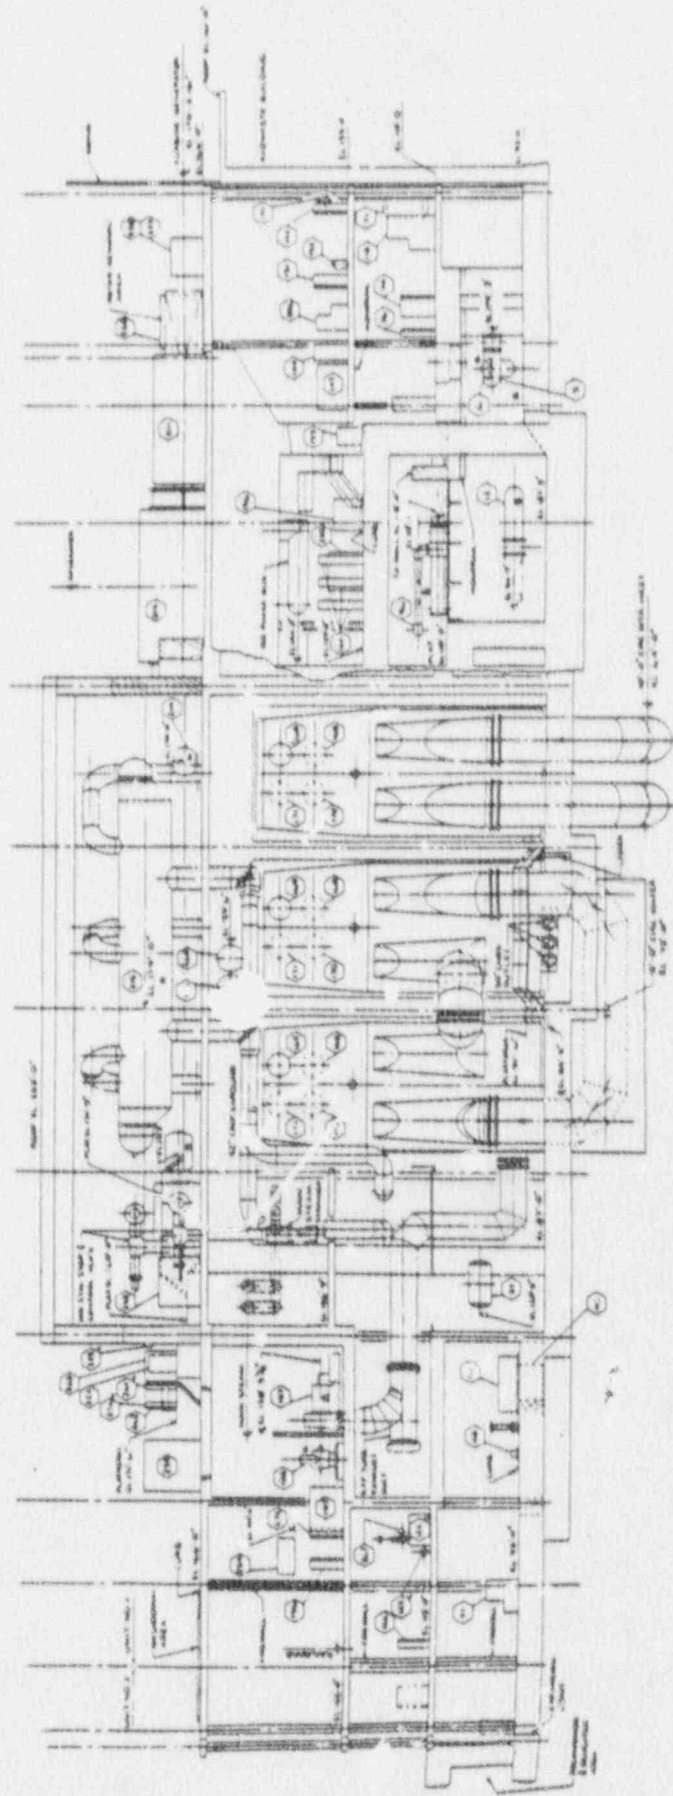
Elevation View of Grand Gulf Tubine Building (looking east)
